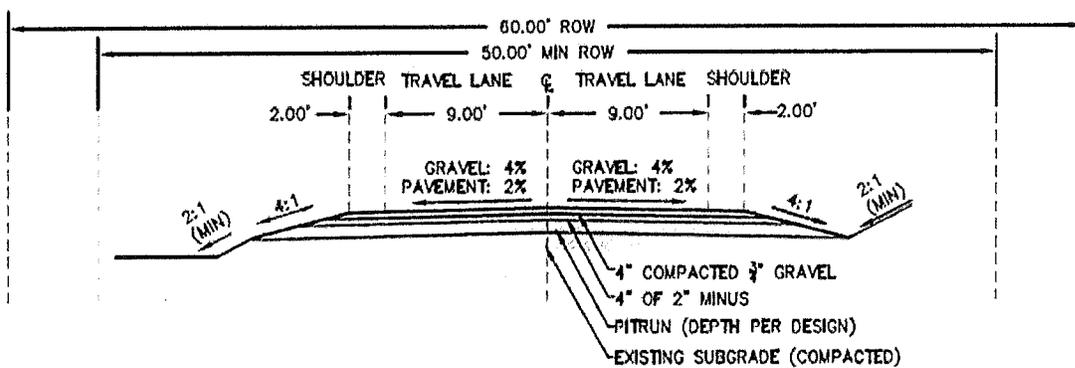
Highway and Street Guidelines for Design and Construction in Teton County, Idaho-4/11/2013 (Page 18 of 46).
